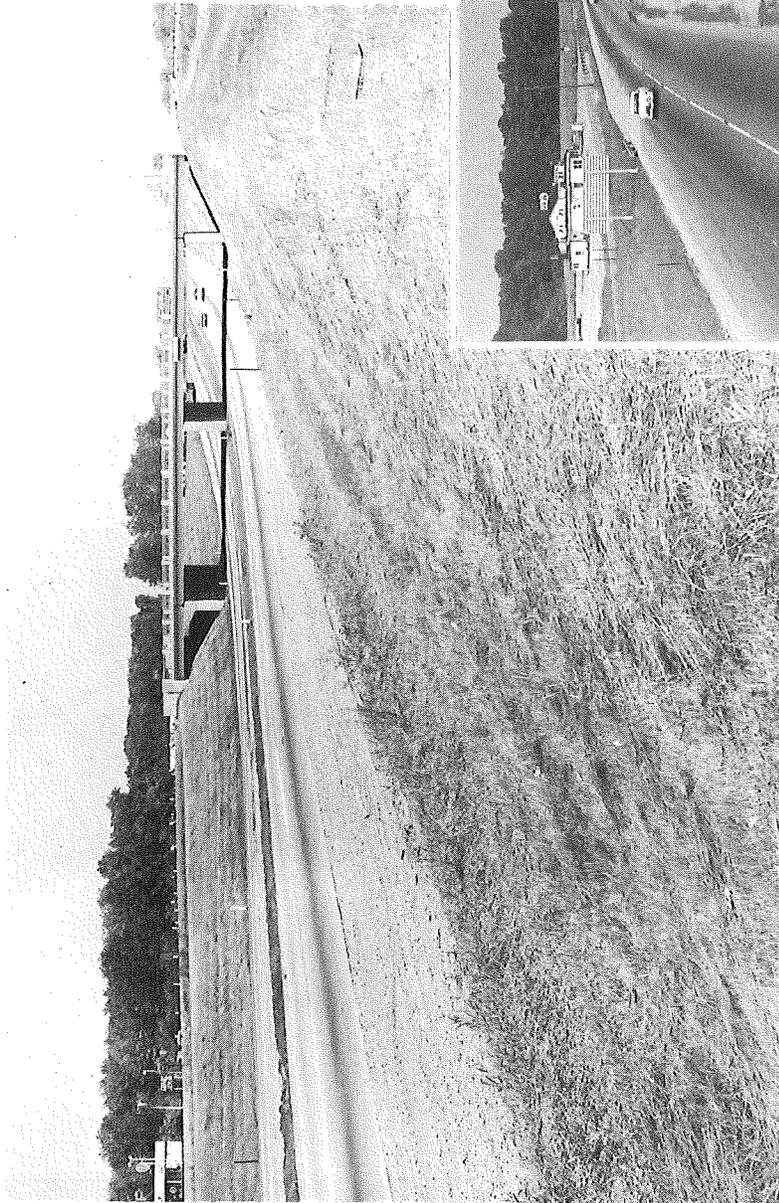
General views of the I 94 pavement looking east toward Belleville Road (above), and from Rawsonville Road (right).
